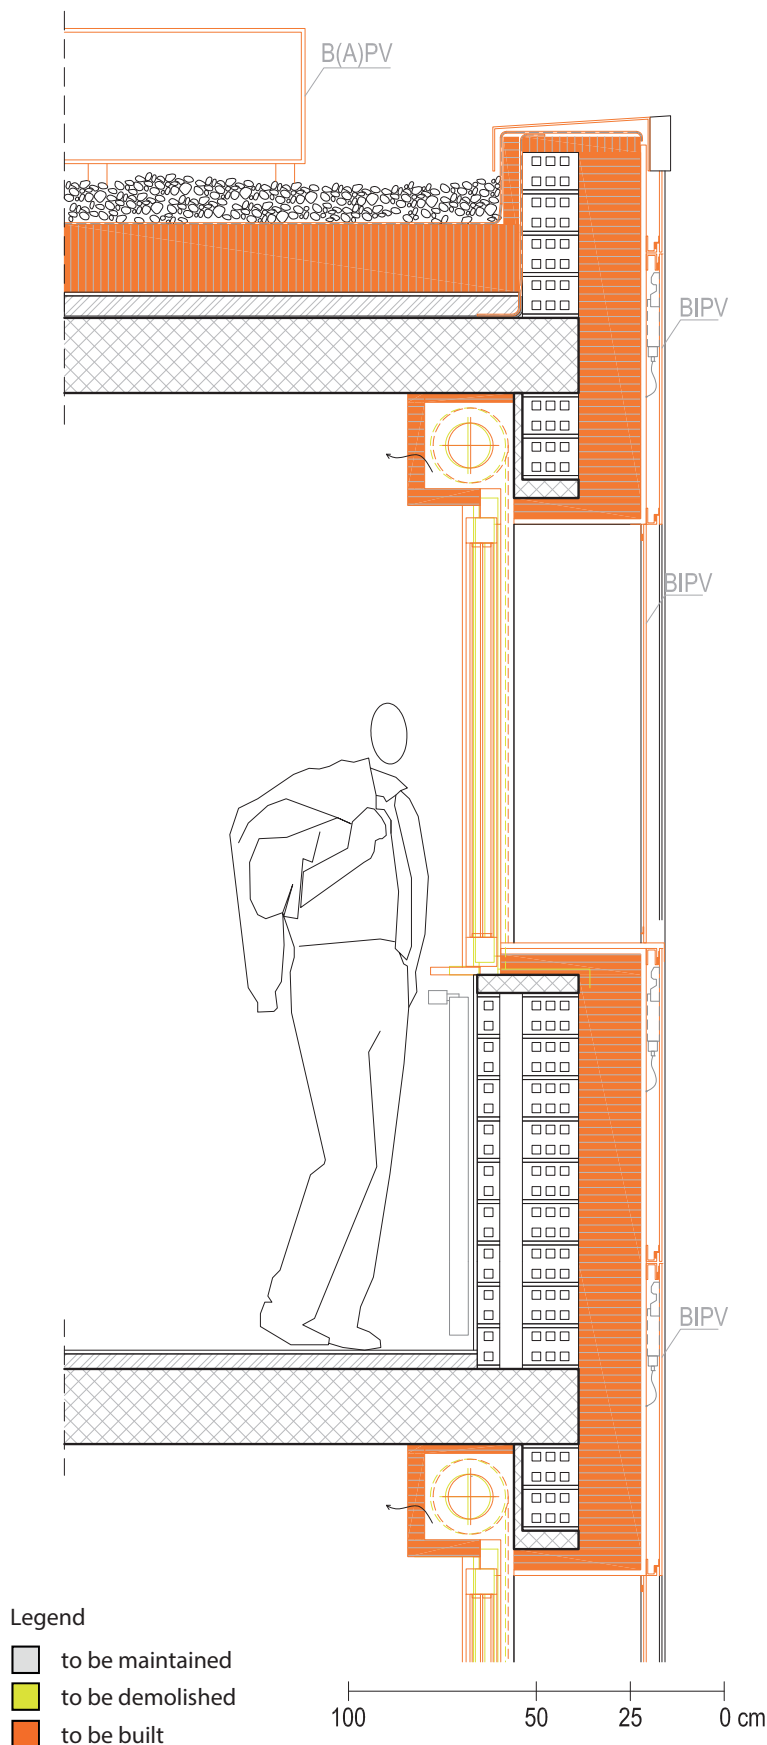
Façade constructive detail, S2 – BIPV Renovation, Archetype 3.
